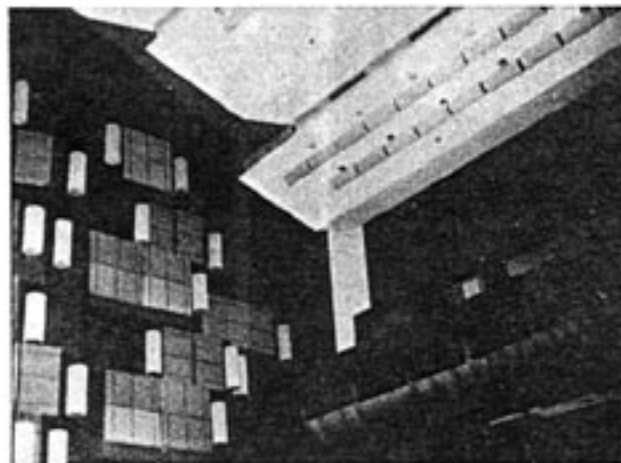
Rear portion of the hall: absorptive treatment of walls and ceiling
